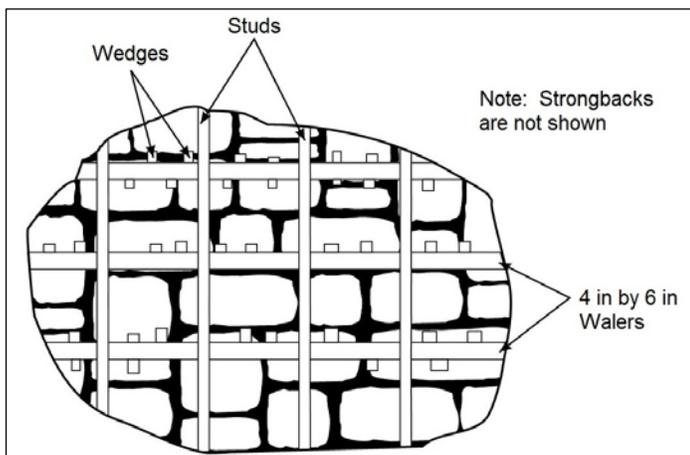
41: Wedge Method of Securing Stone Masonry Faces for Concrete Placement
